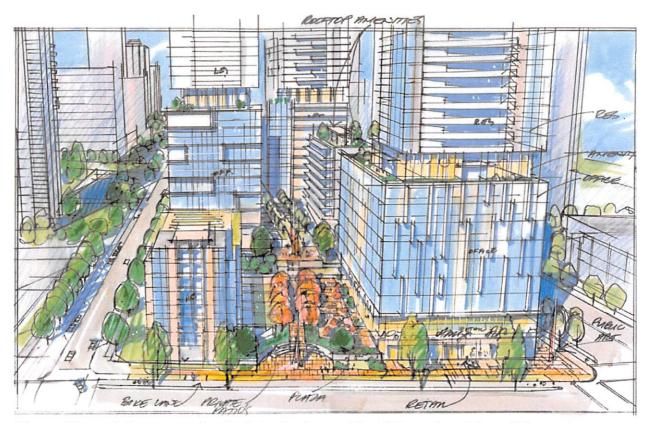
Artistic concept sketch of the Buchanan West Site as viewed from Gilmore Avenue
